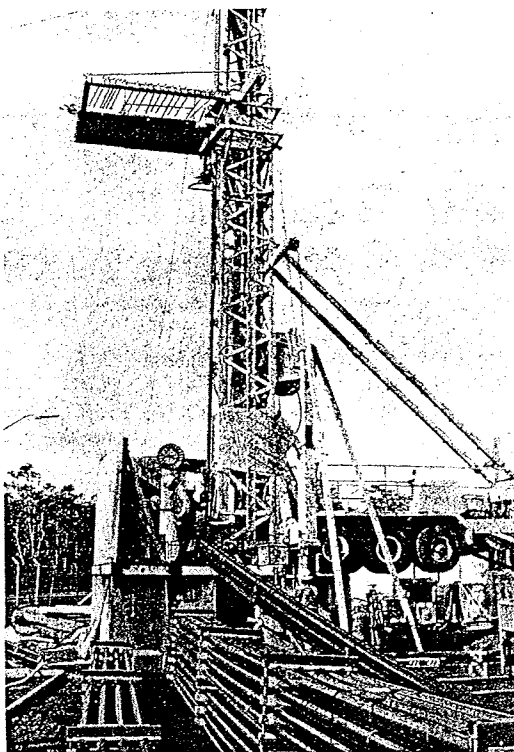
Drilling rig and insulated inner pipes before the installation.
